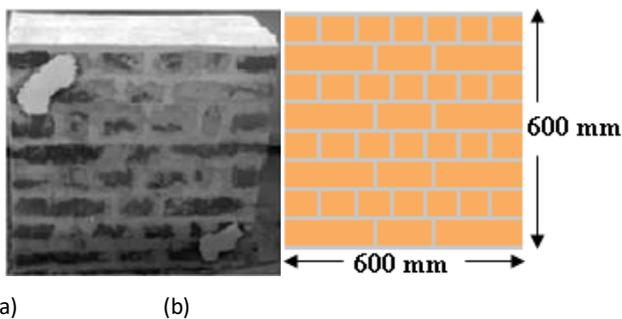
Wall configuration; (a) Un-reinforced burned clay brick masonry wall and (b) Wall geometry
